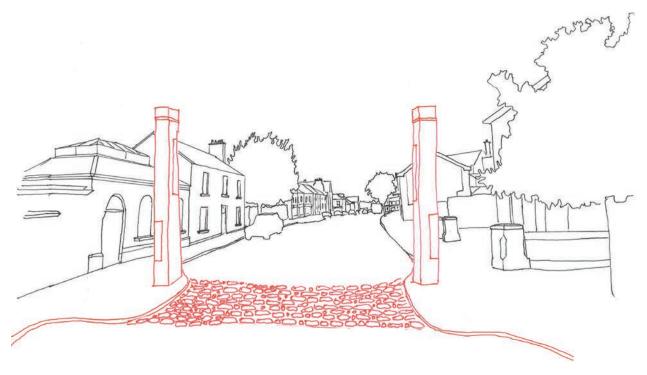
Sketch view showing proposed piers containing signage and cobble pavement, marking location of White Gate.
